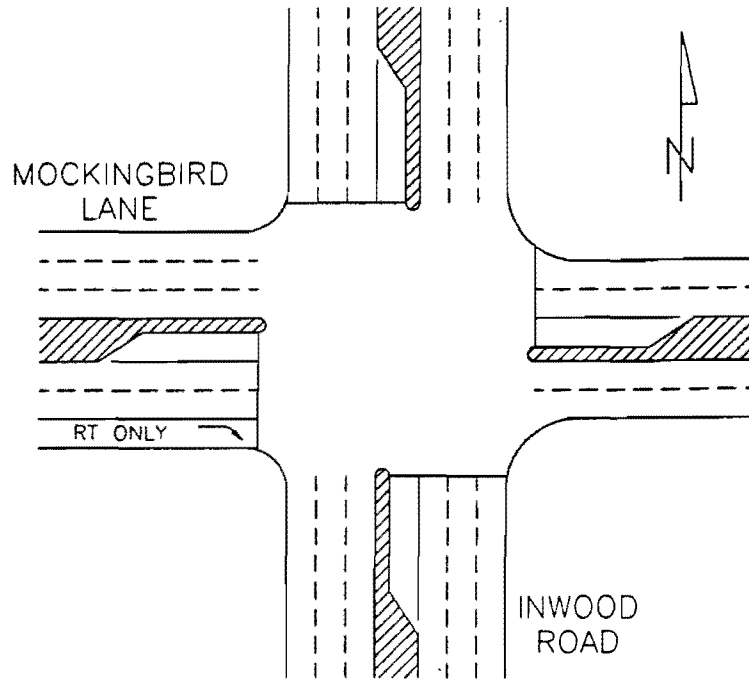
Mockingbird Lane and Inwood Road, Dallas TX.
